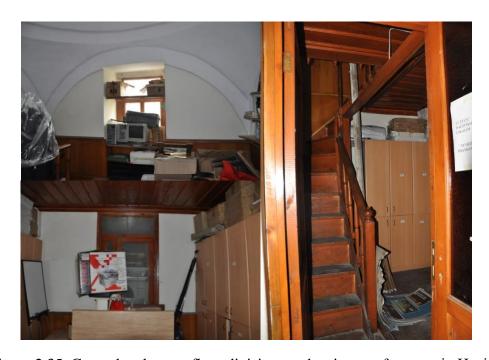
Ground and upper floor divisions and staircase of a room in Haci Beşir Ağa Medrese, 2011
